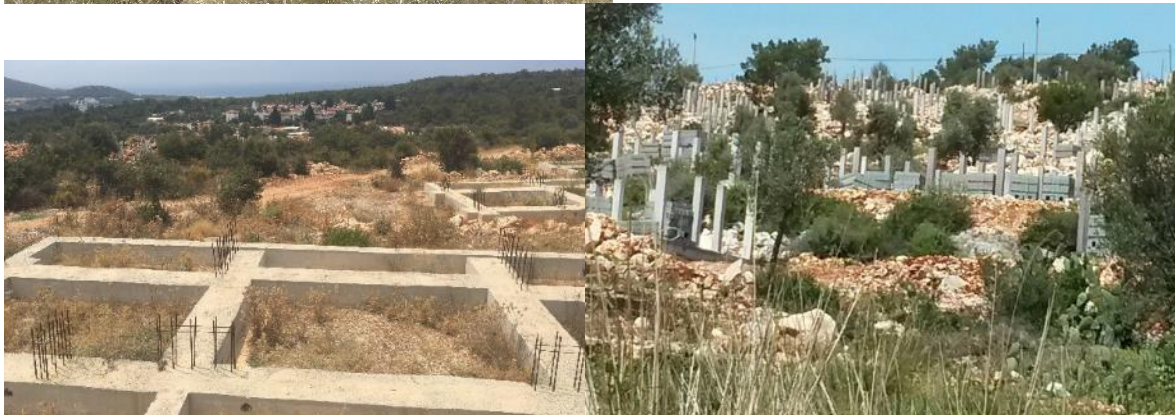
Patara SPA. 3rd Degree Archaeological Site. June 2016. Construction work continues for approx. 310 buildings in different stages of construction: ground work, foundations, shells, semi-completed buildings.
